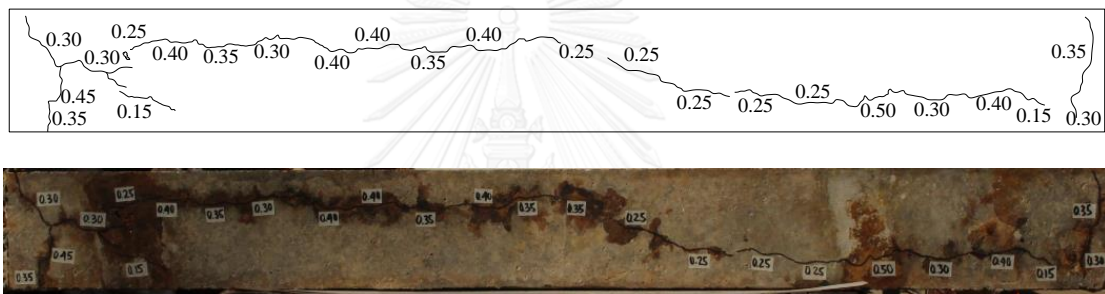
Crack pattern and crack width of SB-MP beam at the bottom (unit: mm)
